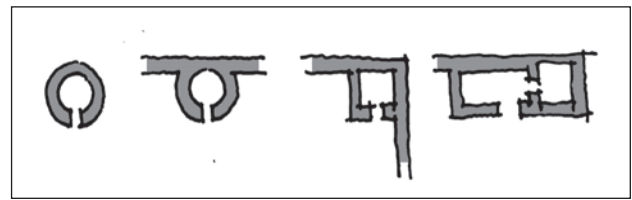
Giren can stand alone in terrain, in the wall or can be built into a wall, with several outbuildings for animals.
